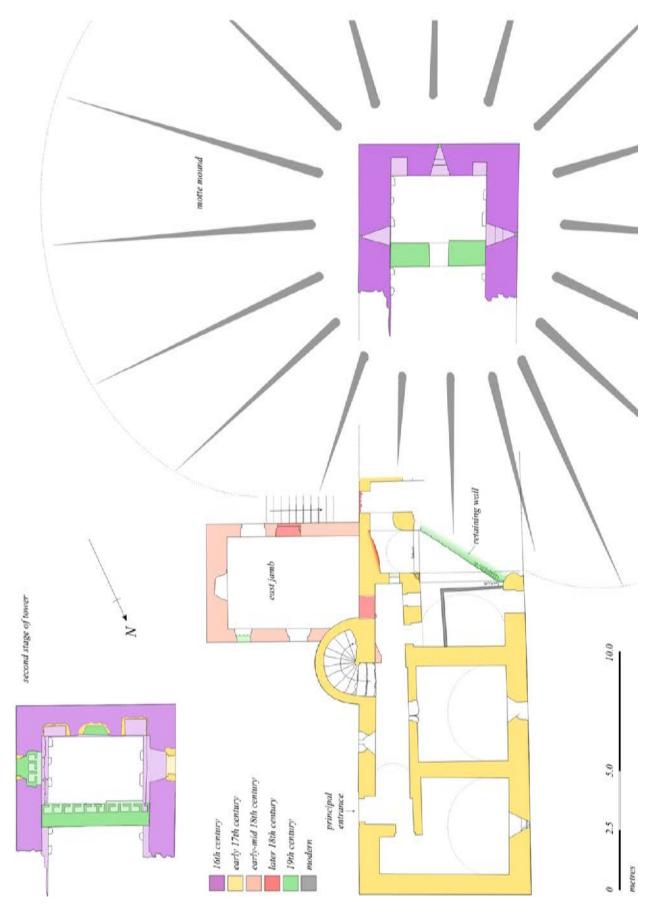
General plan showing phasing Tower footing structure to east, west and south (Trenches 3, 4, and 5)
